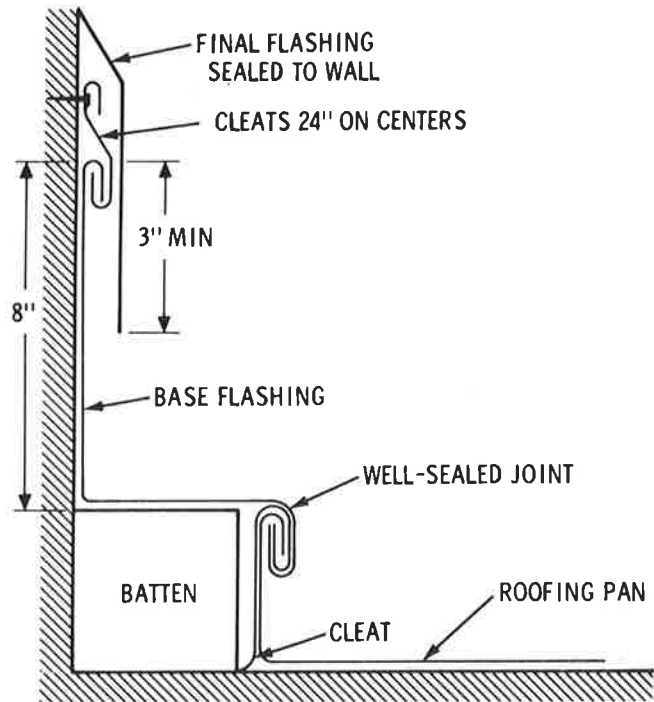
SHEETWORK DETAILS AT VERTICAL WALL
